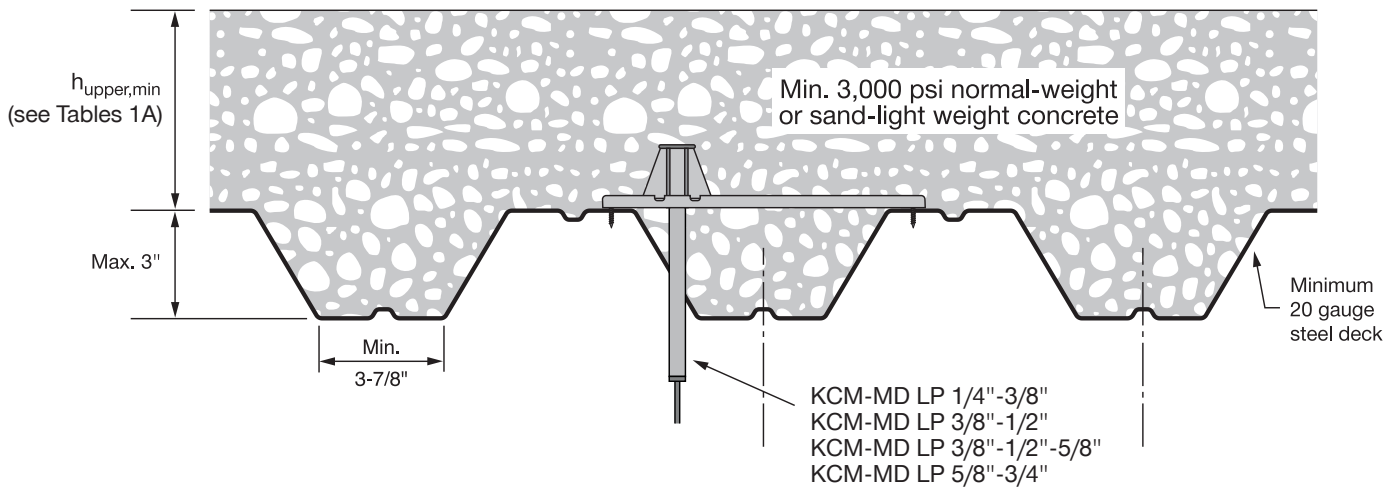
D — Installation in the soffit of concrete filled metal deck floor and roof assemblies-over flute incline (W-deck)
